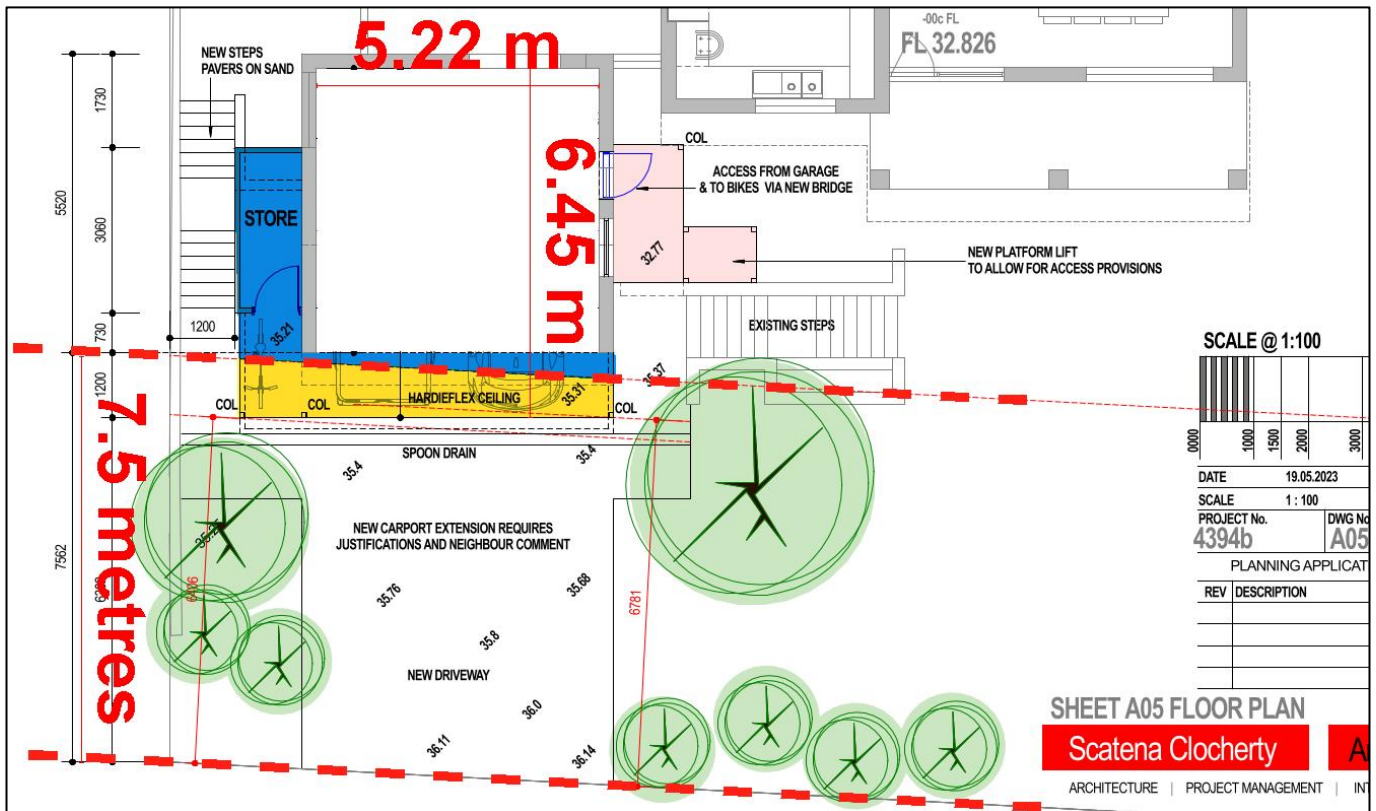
Marked-up floor plan showing the proposed combined garage/carport structure will have a .
